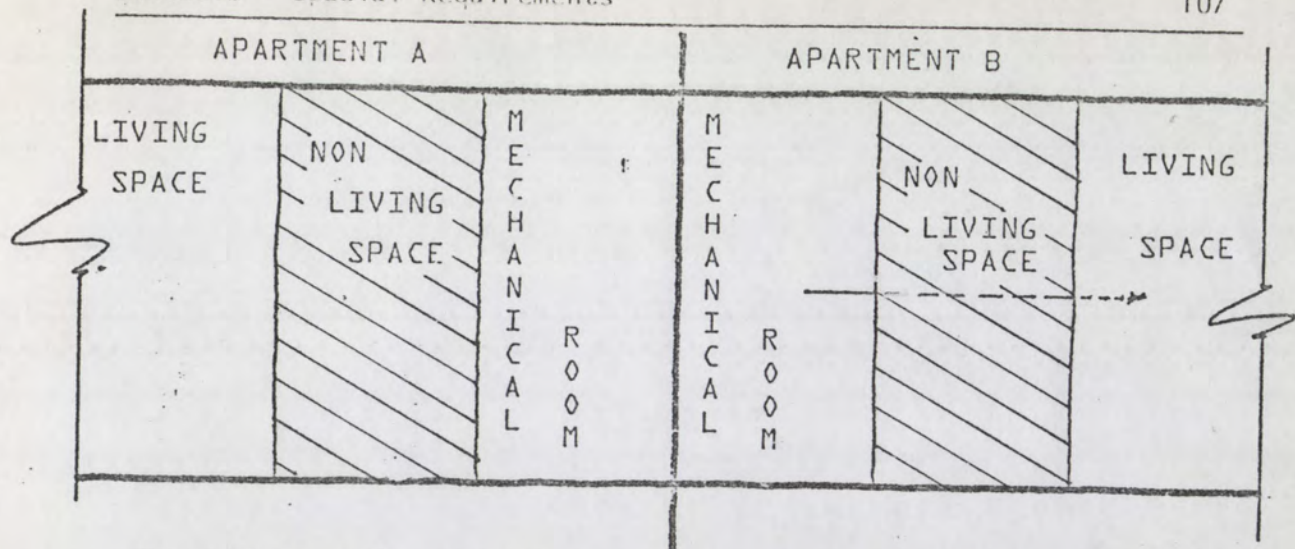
Apartment Complex Distribution - Buffer Zone Between Noise Source And Living Areas
